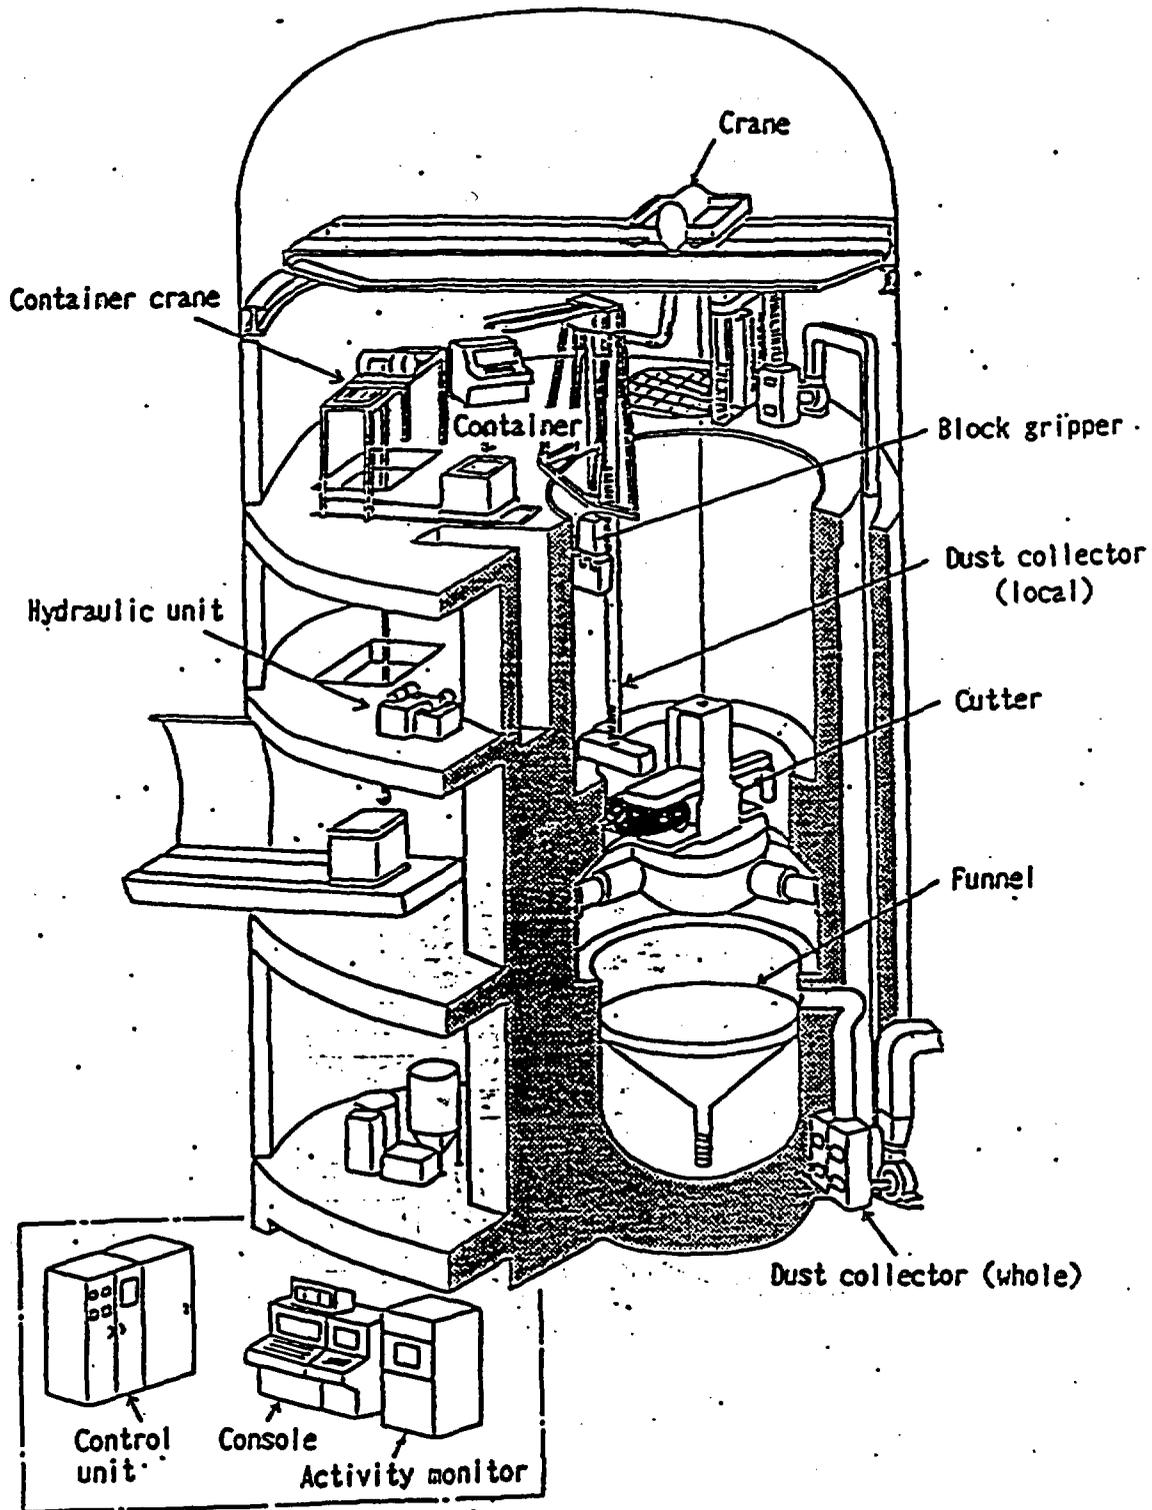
DIAMOND SAWING AND CORING CUTTING SYSTEM.
